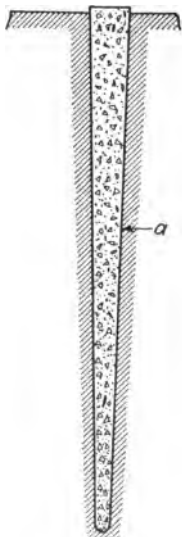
a shows a type commonly used when the piles are constructed in forms, and hardened, and driven just as a wooden pile. These piles must be reinforced with steel so that they can be handled.
